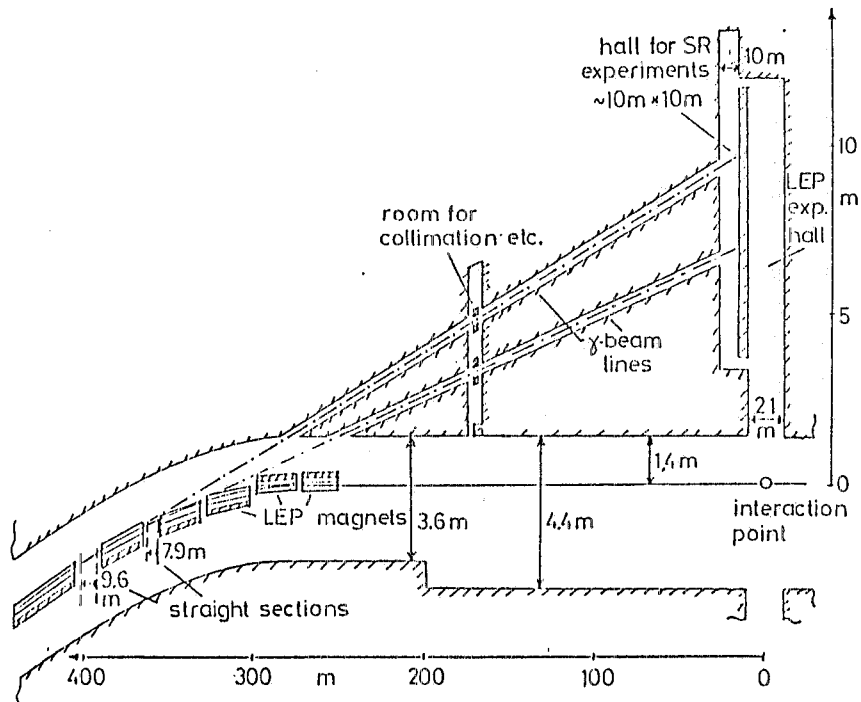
Possible lay-out of the photon beams originating at the two free straight sections. If necessary, a full size tunnel could be constructed between the experimental hall and the collimator room.
